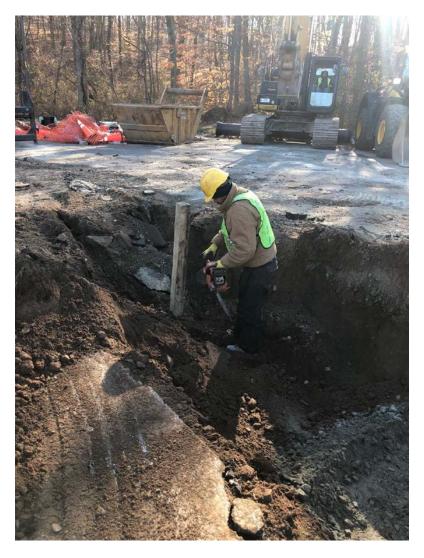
4"x4" timber placed at end of pipe run to mark its location. Talcott Ridge Road cul de sac; view to the southeast.
